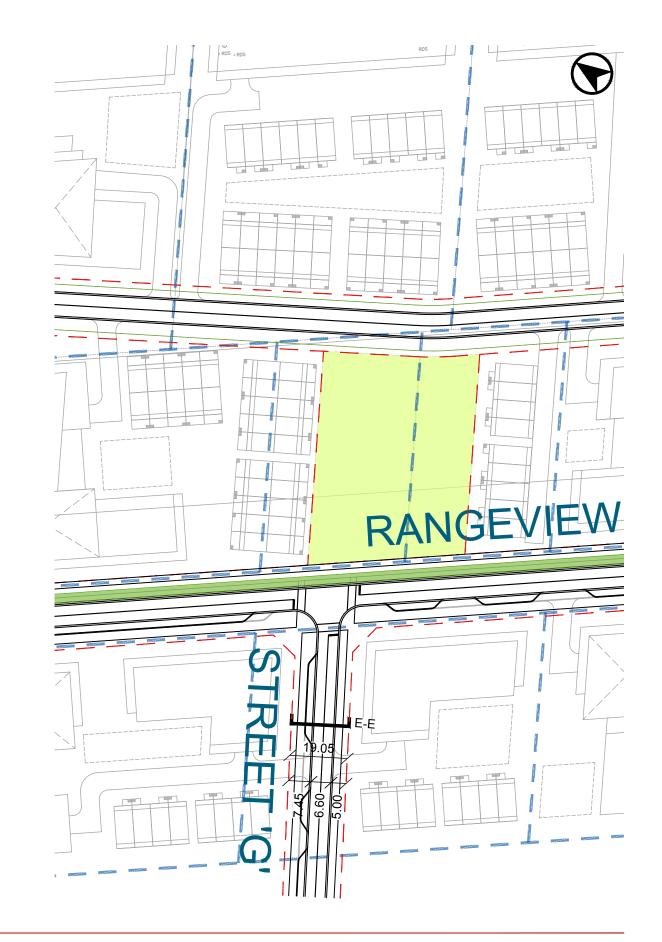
PROPOSED STREET 'G' EXTENSION - FUNCTIONAL PLAN & CROSS-SECTIONS
